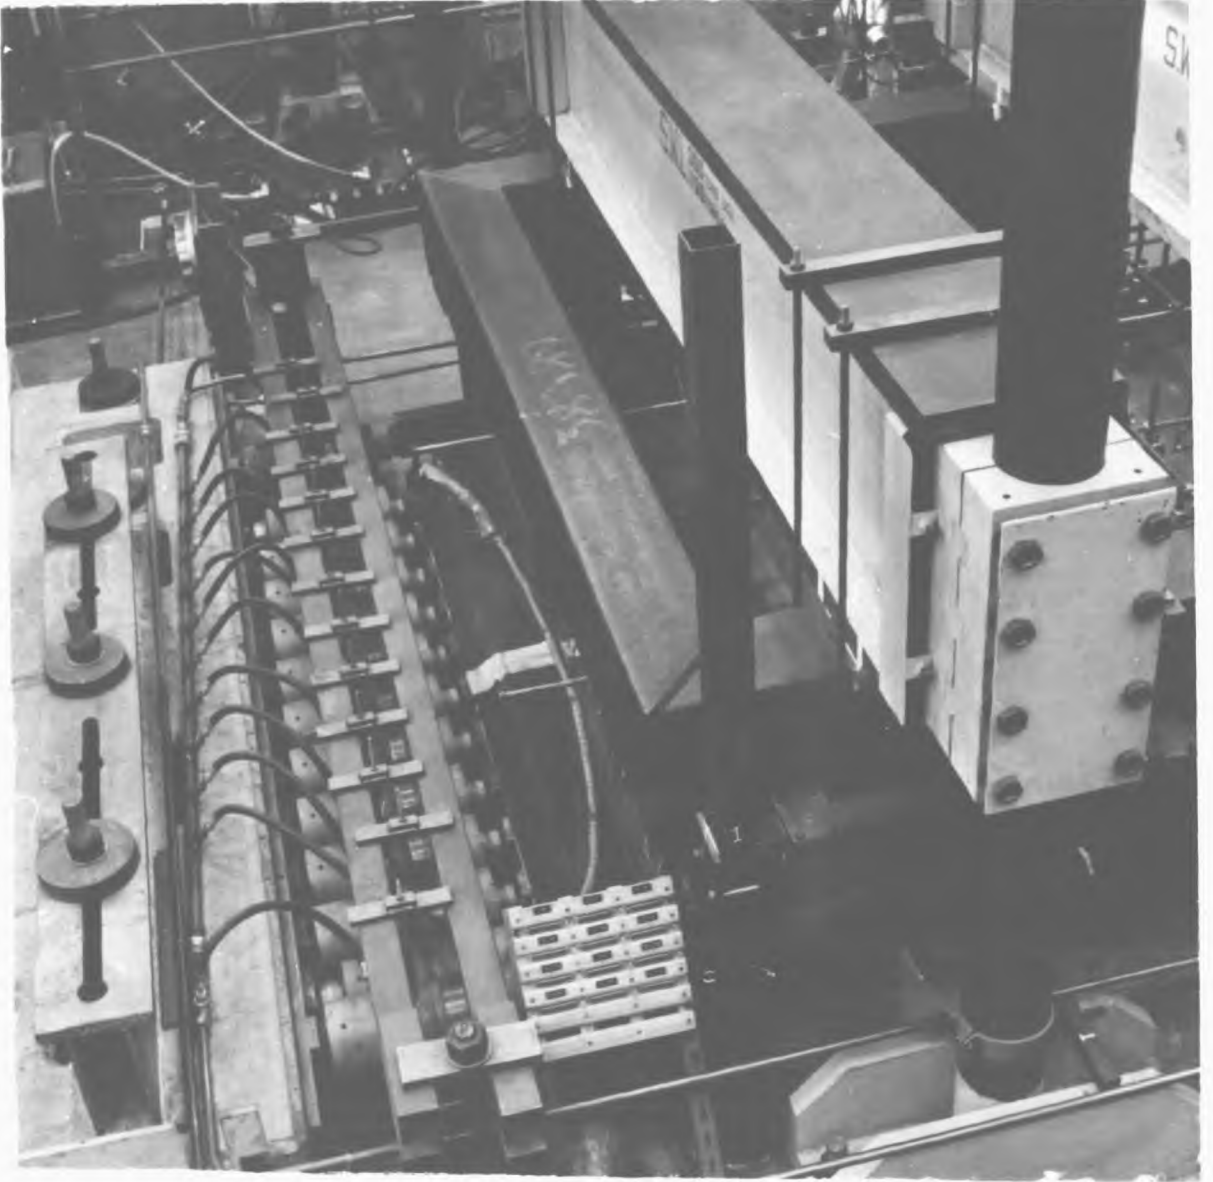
Longitudinal Rams in Position at Bulkhead End
